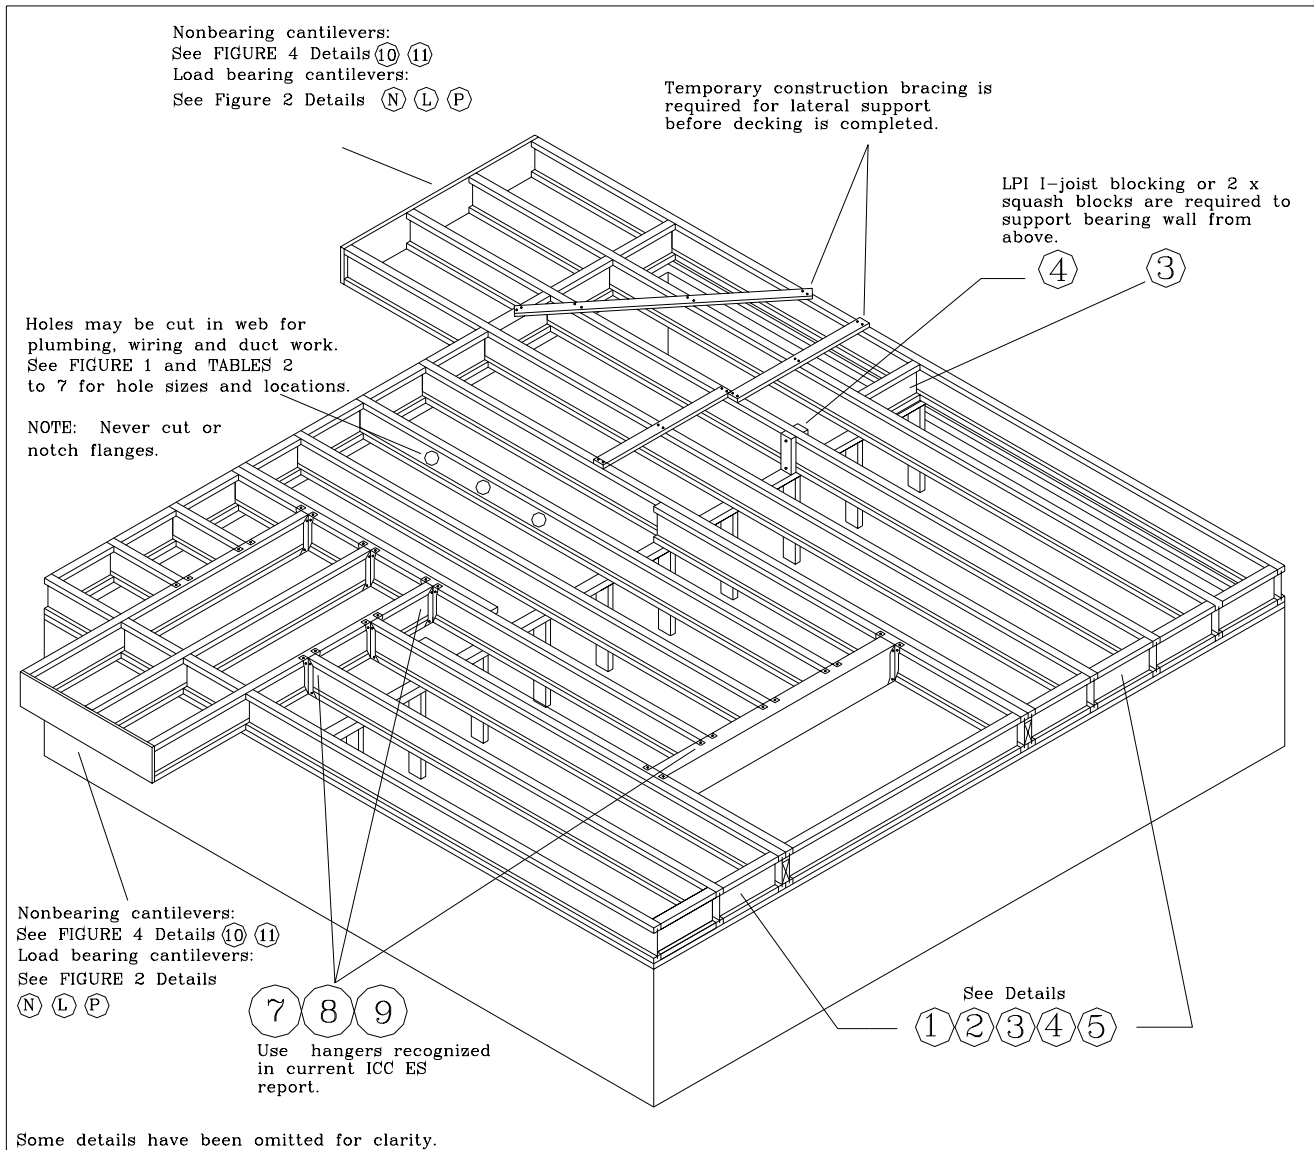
TYPICAL I-JOIST FLOOR LAYOUT
